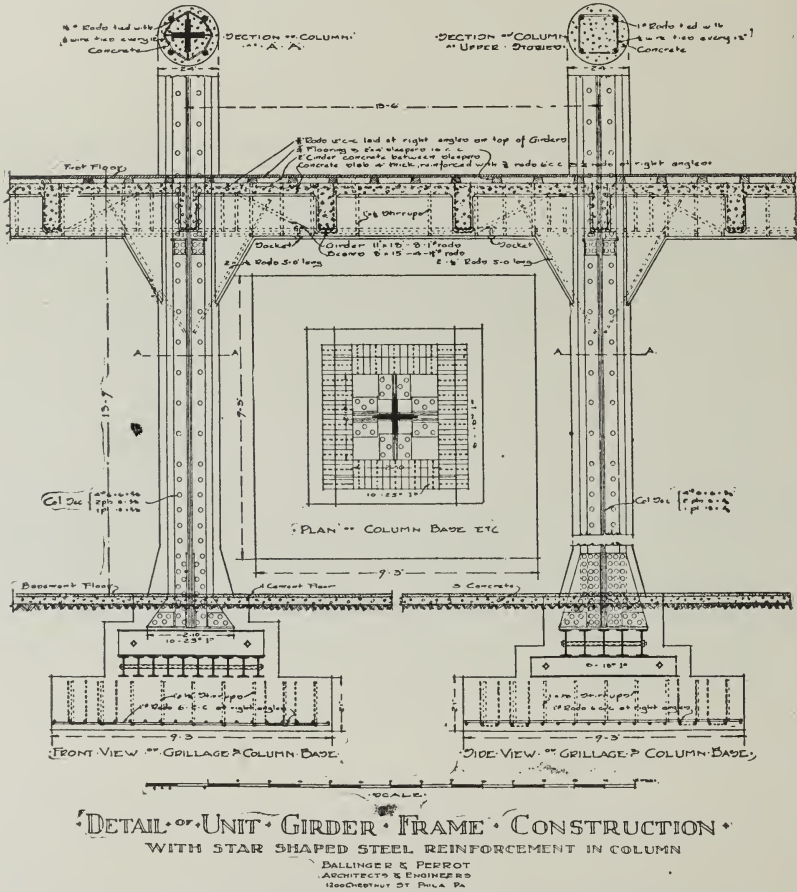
Section Through a Bay of Ketterlinus Building, Philadelphia, Pa.
